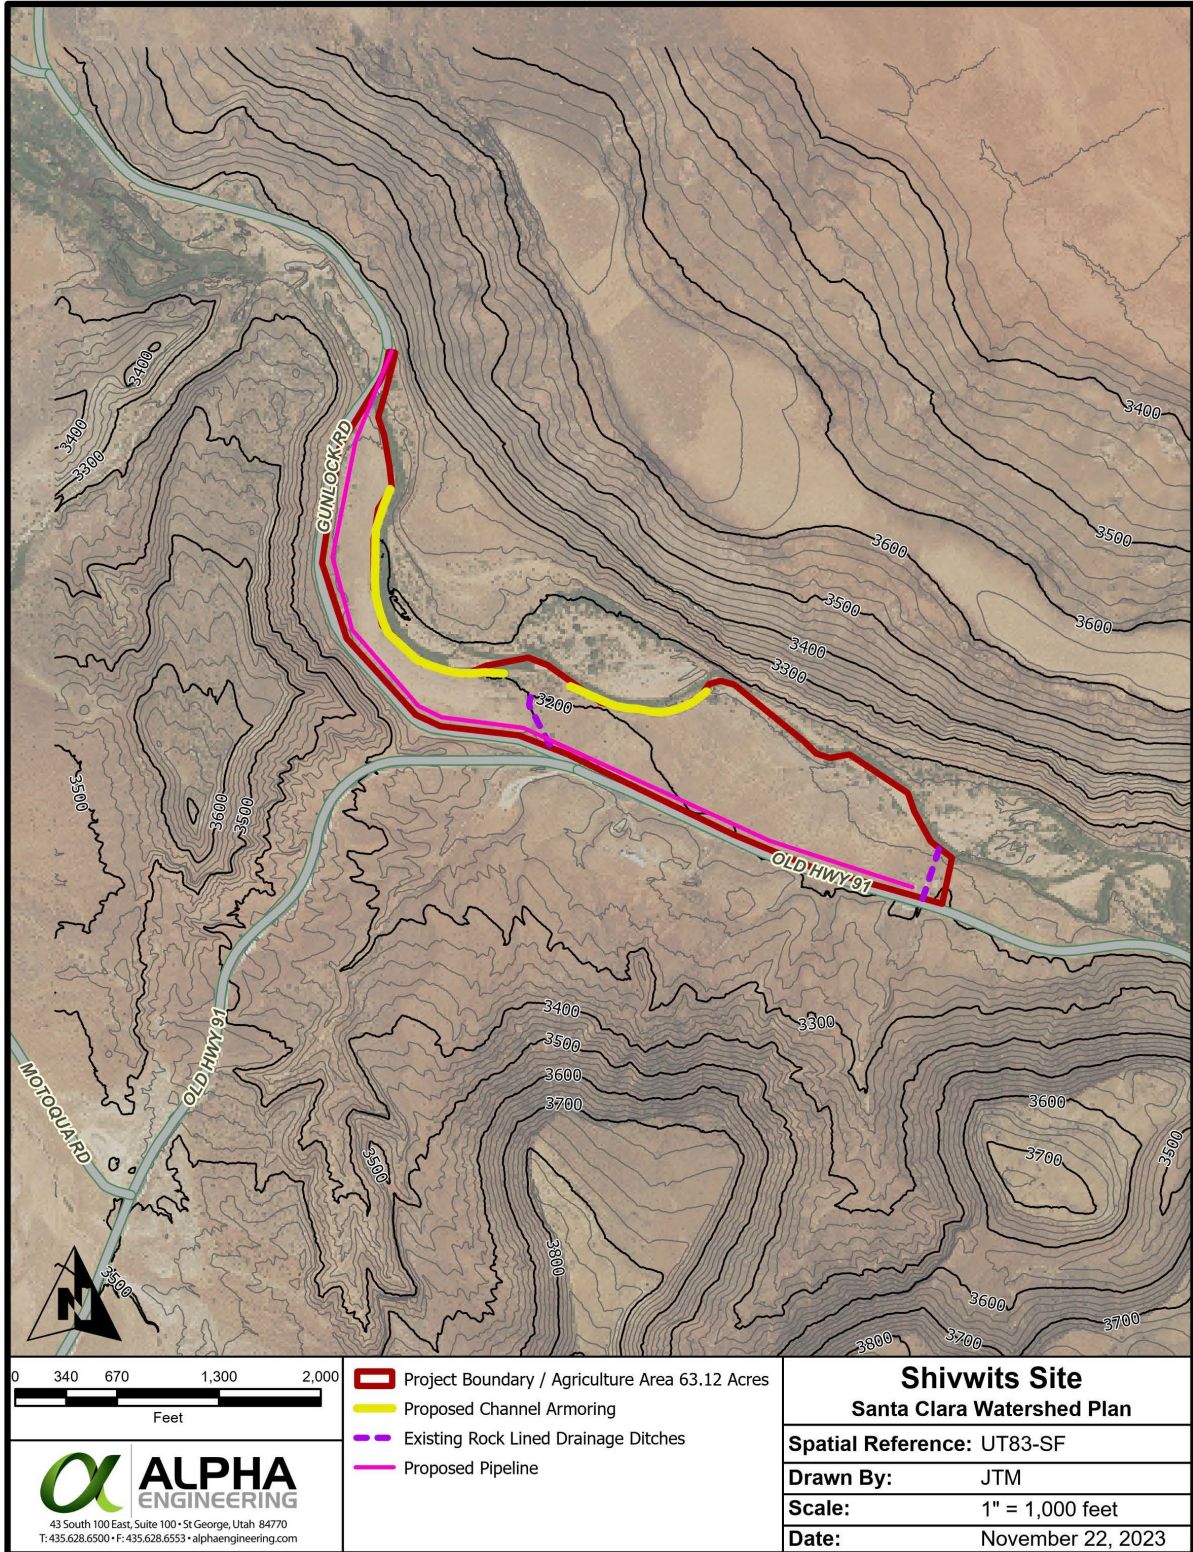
Shivwits Santa Clara River armoring, pipeline installation, and stormwater drainage ditch repair
